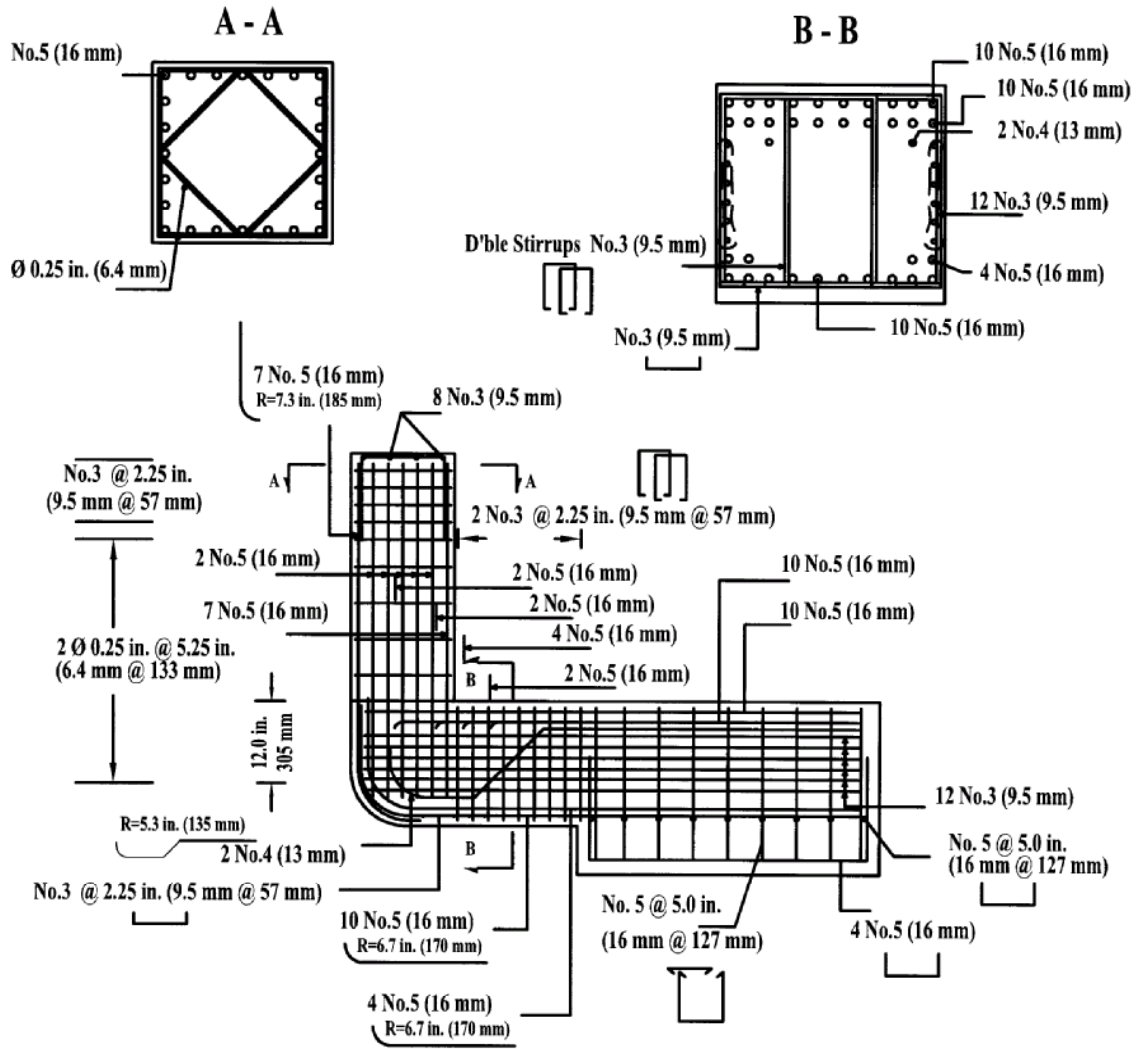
As-Built Short Outrigger Specimen Reinforcement Details
